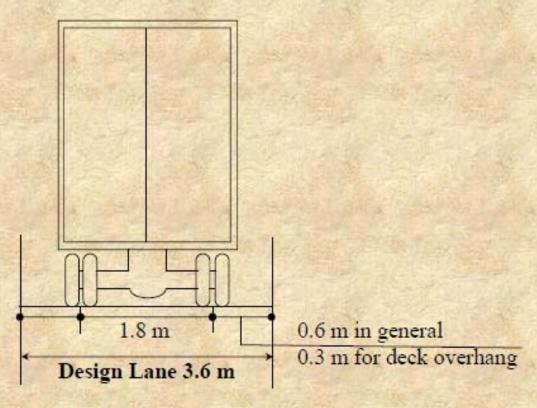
Back View of Truck Showing Transverse Clearances.
